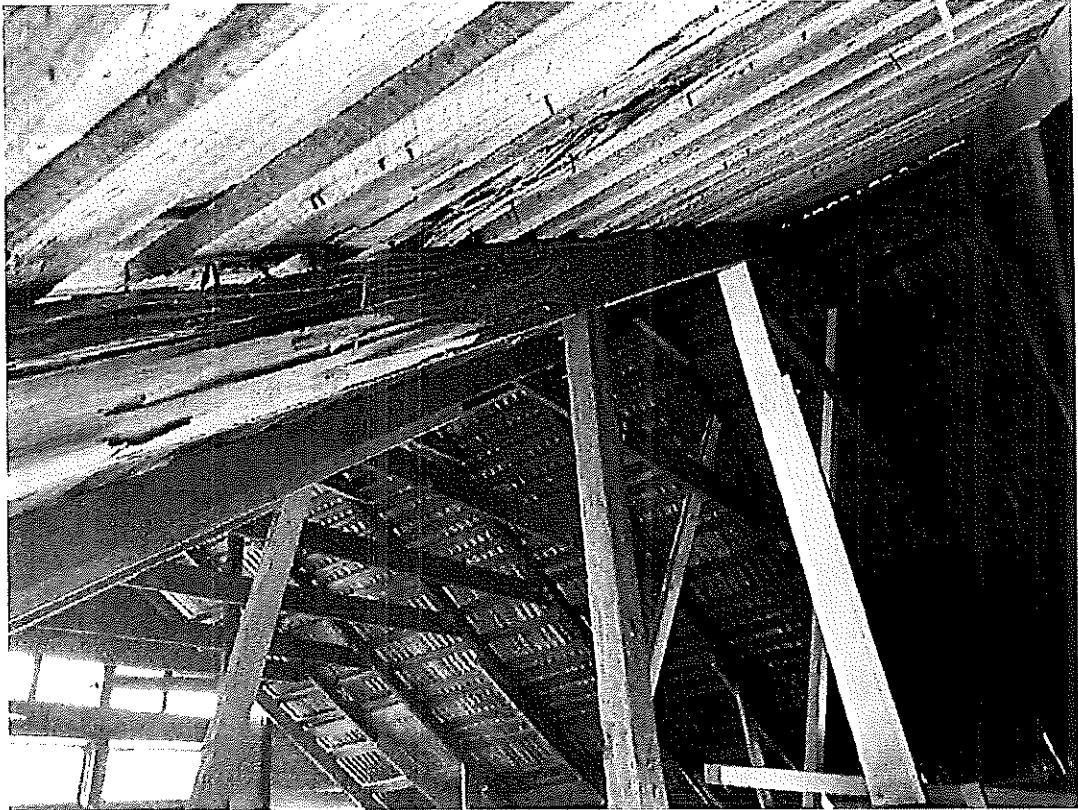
roof deterioration of purlins, rafters, and cross bracing. In addition, no indication of a load path connecting rafters and plates to walls.
